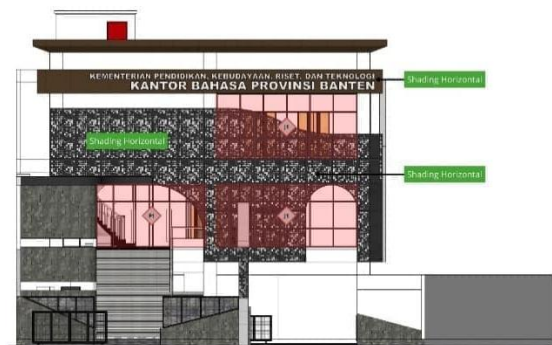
(b) Type of openings and shading on the south elevation (source: author, 2026)
